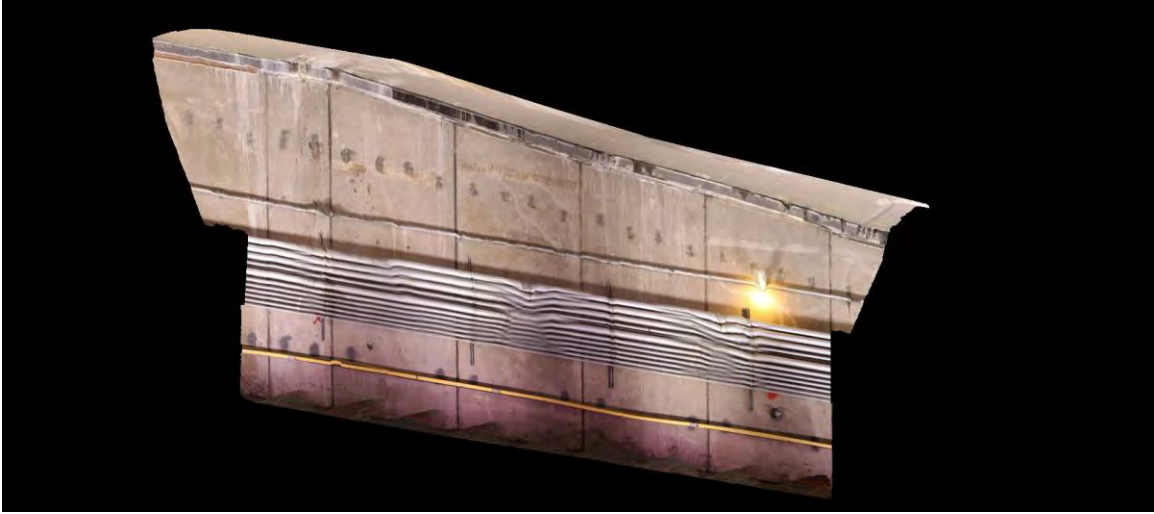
Eisenhower-Johnson Tunnel: clean air supply duct south-west ventilation building: divider wall.
